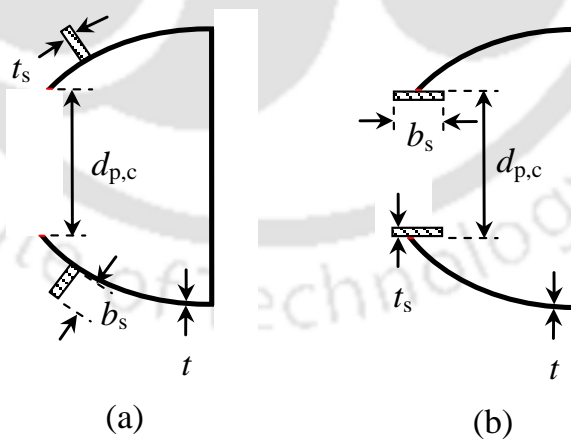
Stiffener arrangements for reinforcing perforation on curve element (a) Horizontal stiffener and (b) Ring stiffener
